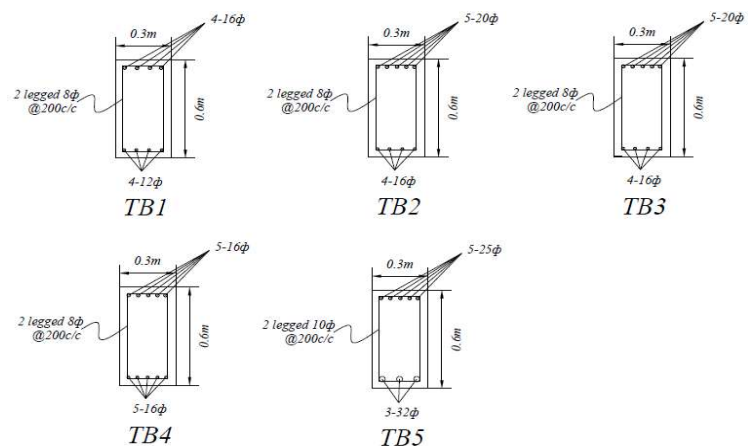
(g). Ground, 1st, 2nd, 3rd & 4th floor beams sectional reinforcement details
